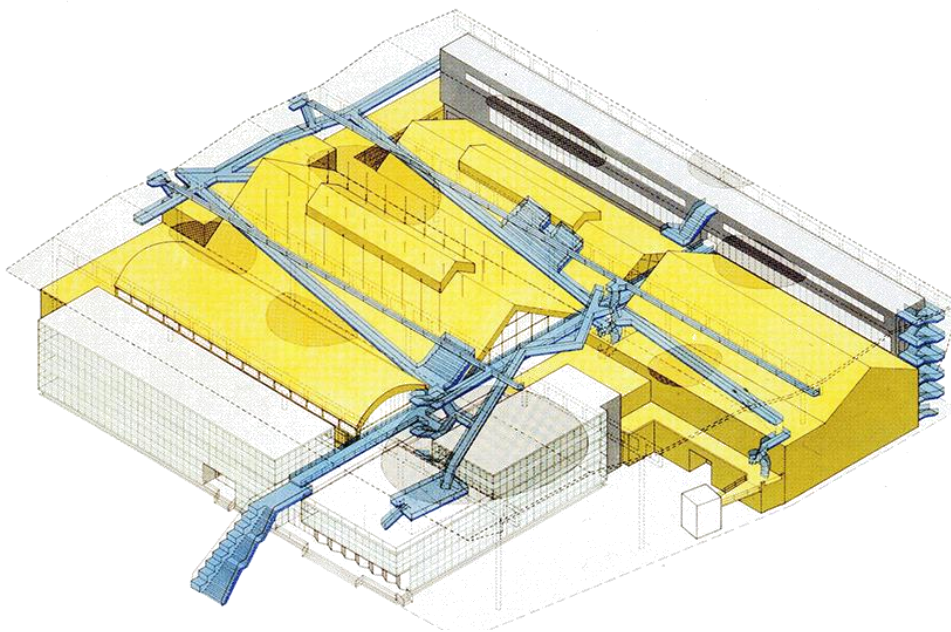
The open plan of the largest building on-site (Author, 2023).
